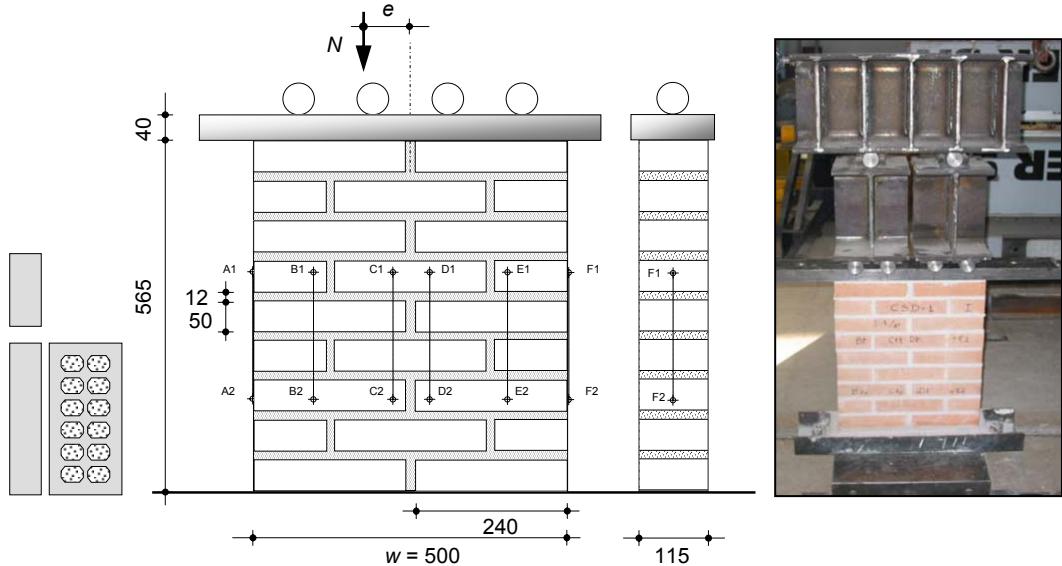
Brick and wallette layout and test arrangement. All dimensions in mm.
